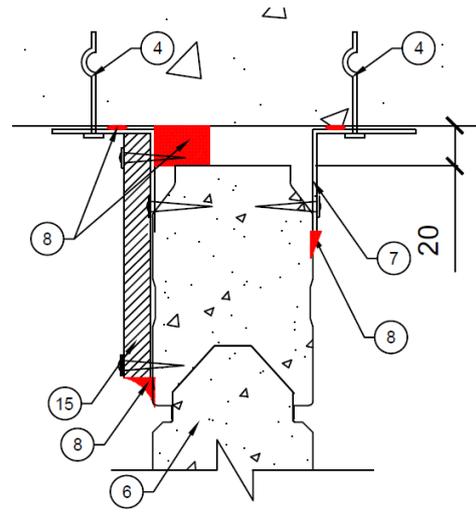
Head Detail for Horizontal Speedpanel Wall
